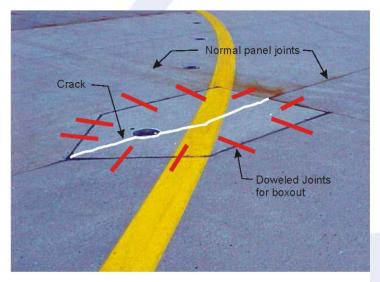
Defective Boxout - Doweled Joints All Sides.
